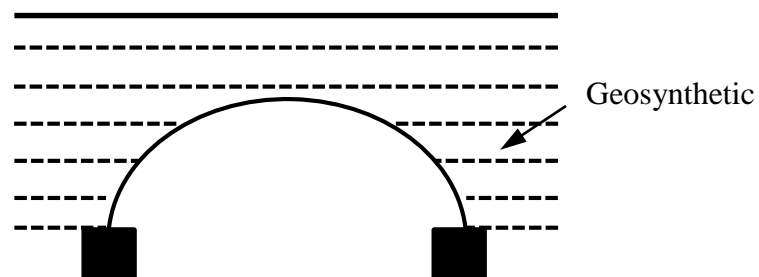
Soil-Steel Bridge Reinforced Backfill (Kennedy et al., 1988)
